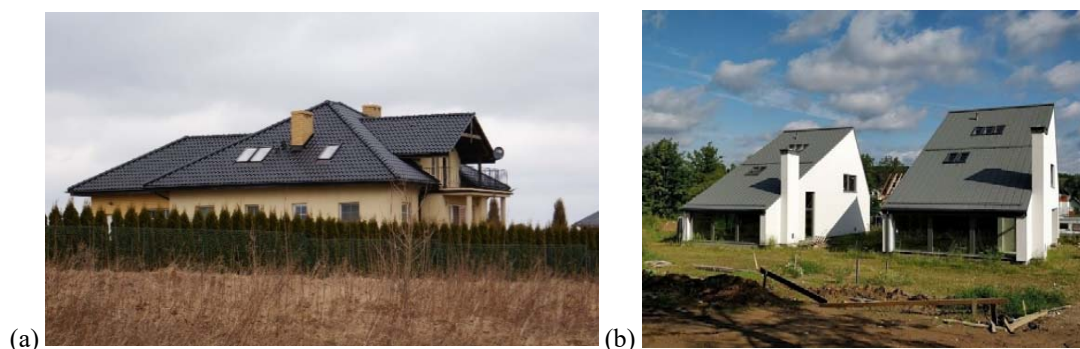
(a) Roof covered with tiles; (b) Roof covered with metal shingles
